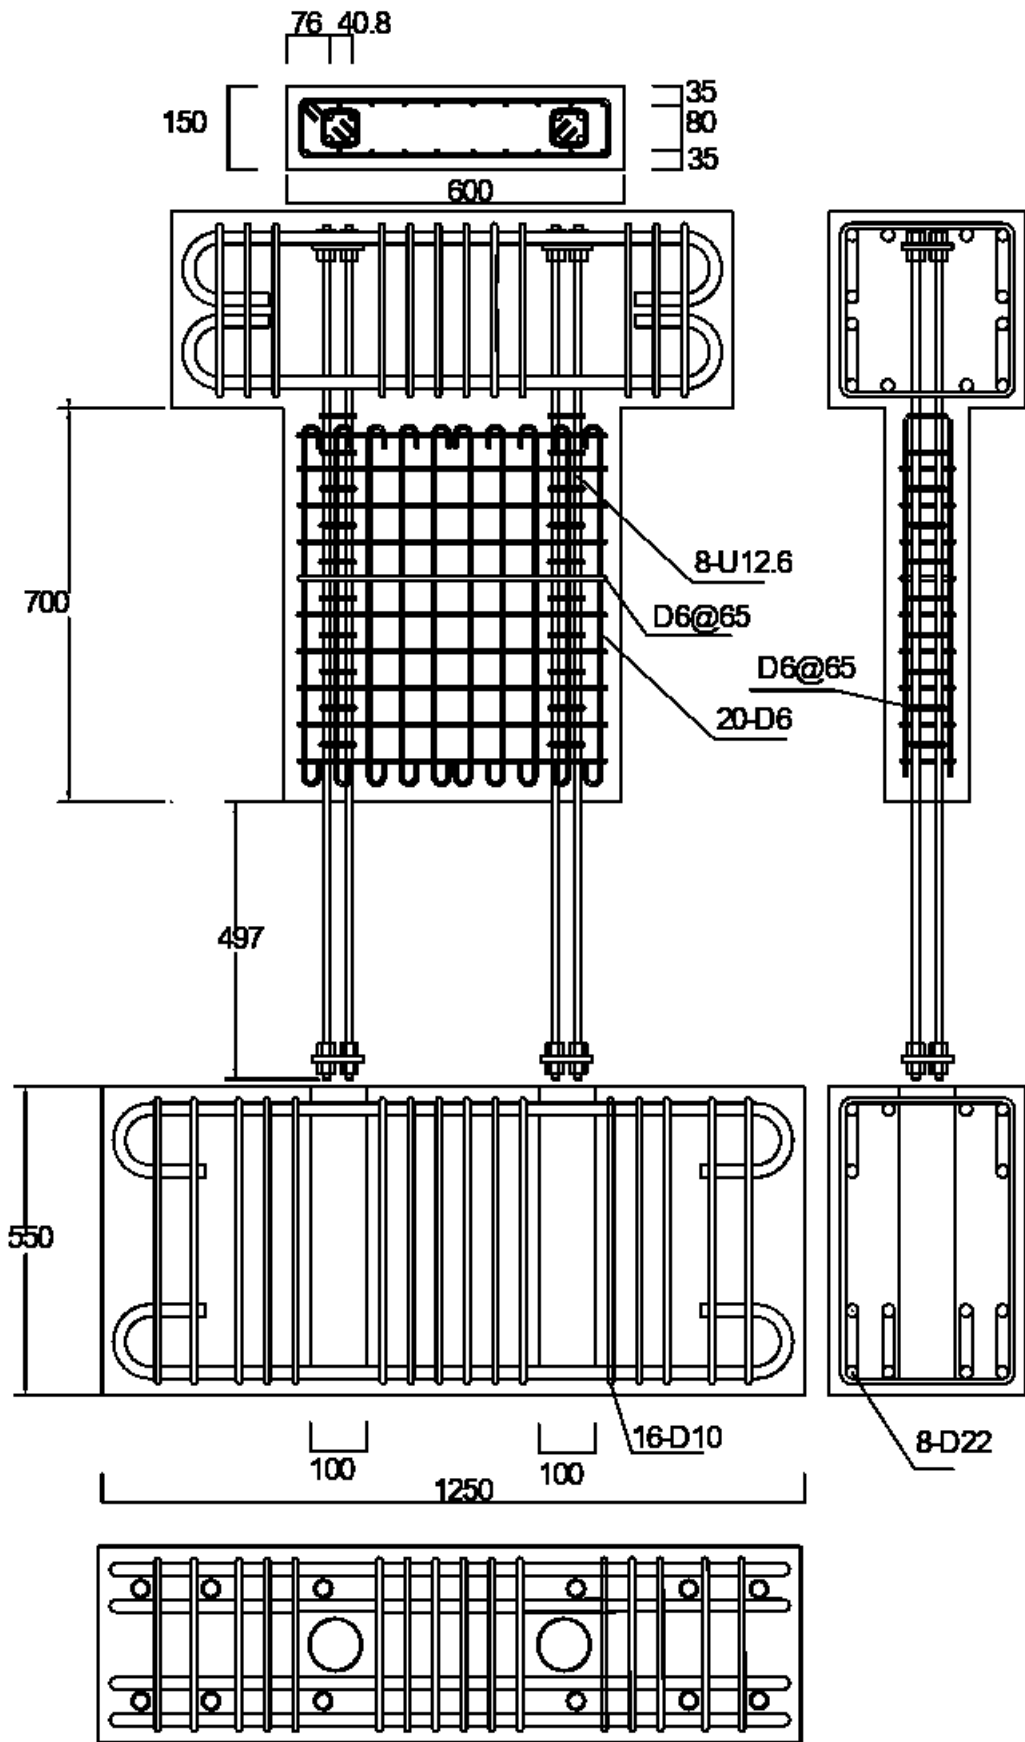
indicates the dimensions and reinforcement details of the specimens, while Table 4.2-1 lists the primary experimental parameters along with the main test results. As shown in Table 4.2-1 and Fig. 4.2-1, all specimens had the rectangular section of 150mm in thickness and 600mm in depth, and the sheath ducts with diameter of 100mm and embedment depth of 510mm were applied for all specimens, it was expected that they can provide sufficient bond strength till the yielding of SBPDN rebars. The specimen of WP15-Series had a shear span of 900 mm to give a shear span ratio of 1.5. As for specimens of WP20-Series, their shear spans were 1200 mm to give a shear span ratio of 2.0.
